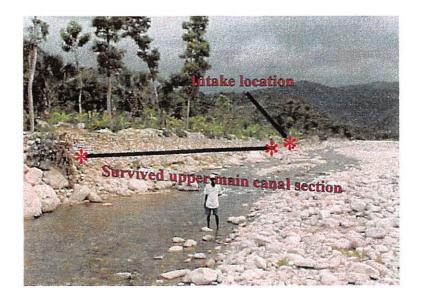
Damaged upper section of main canal at the Belle Roche site. The rock walled section of the main canal survived the flooding but the left end of the section was completely cut off.
